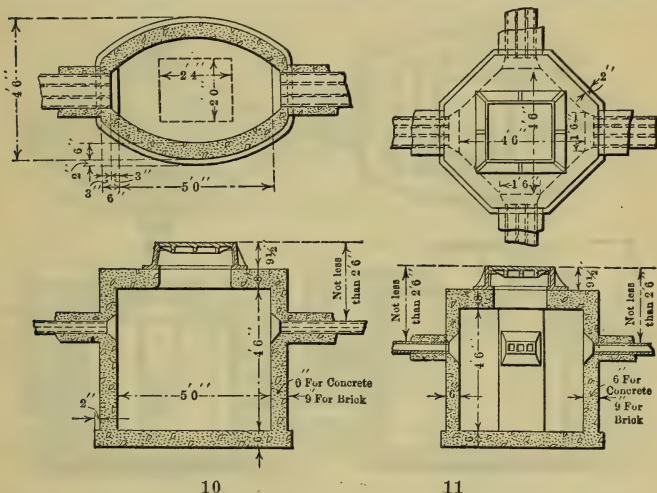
Vault size 1 to be used on runs of 1 to 3. Ducts of conduit when not intersected.
